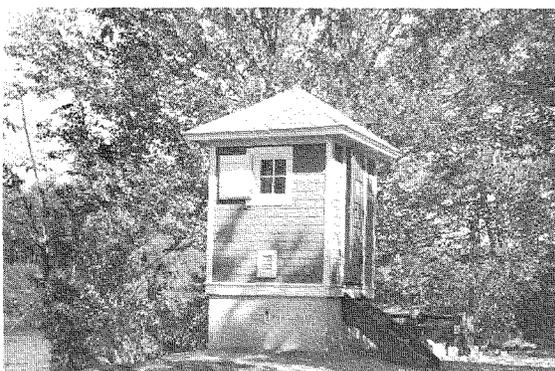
Concrete well and wooden shelter with asphalt shingle siding.
